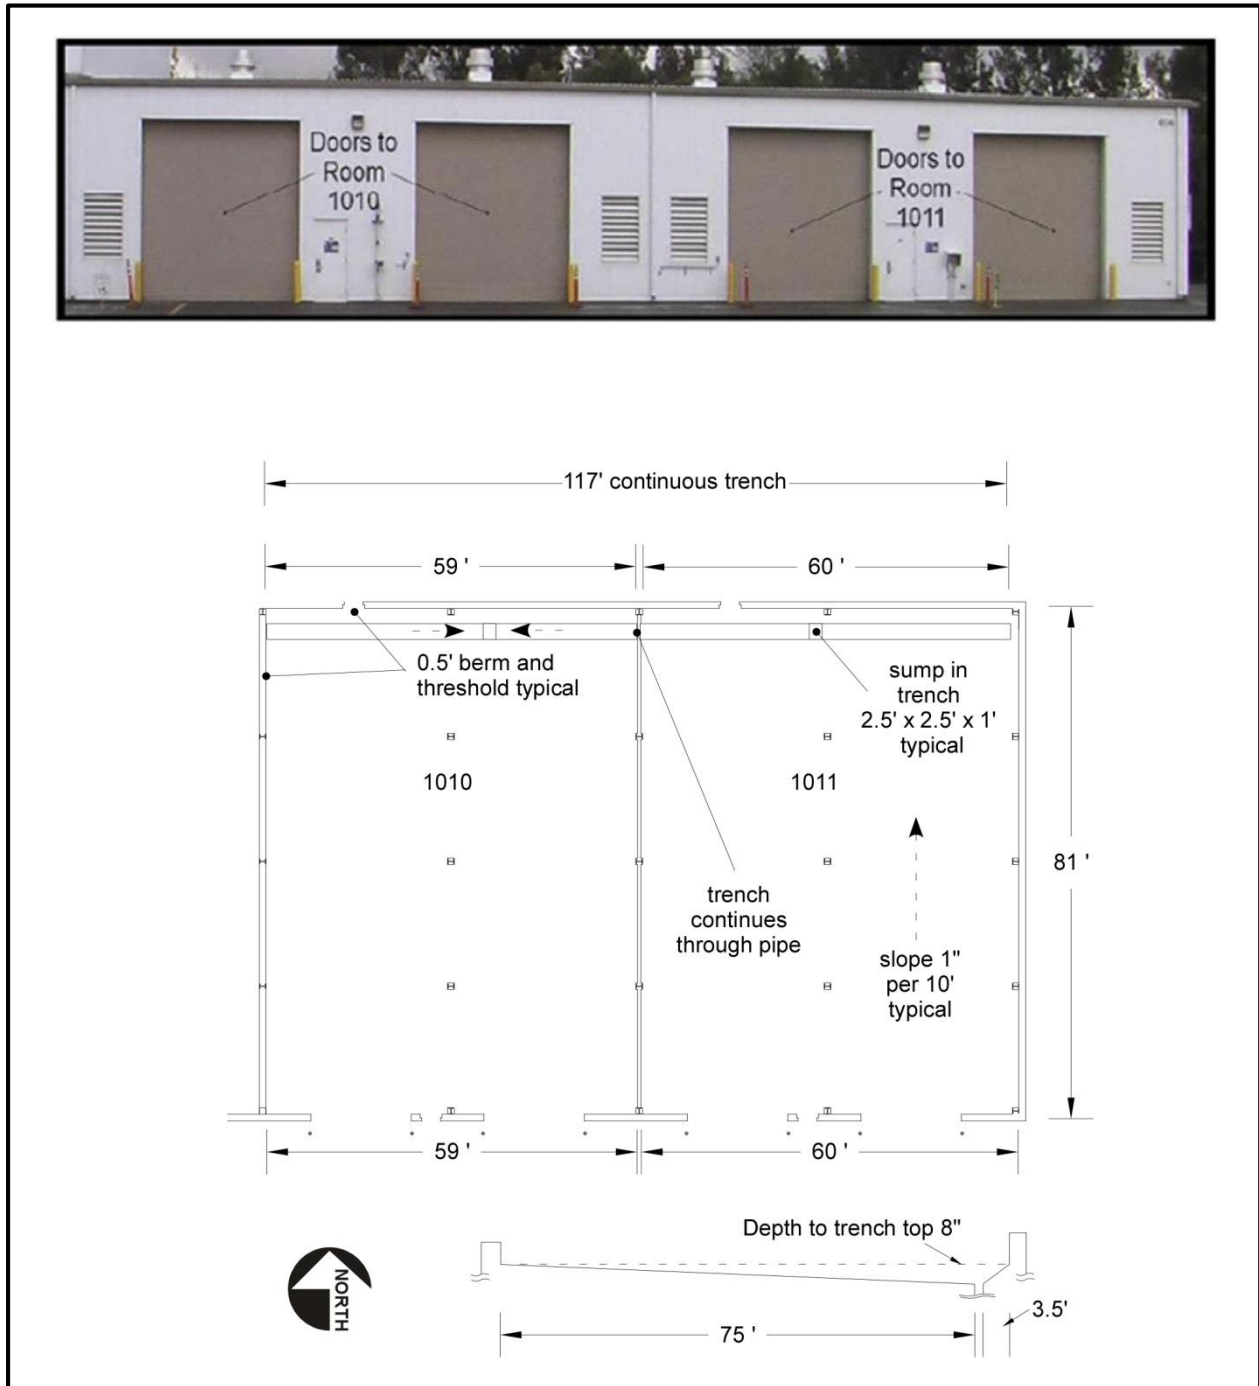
Building 696 Rooms 1010 and 1011 Storage Unit
